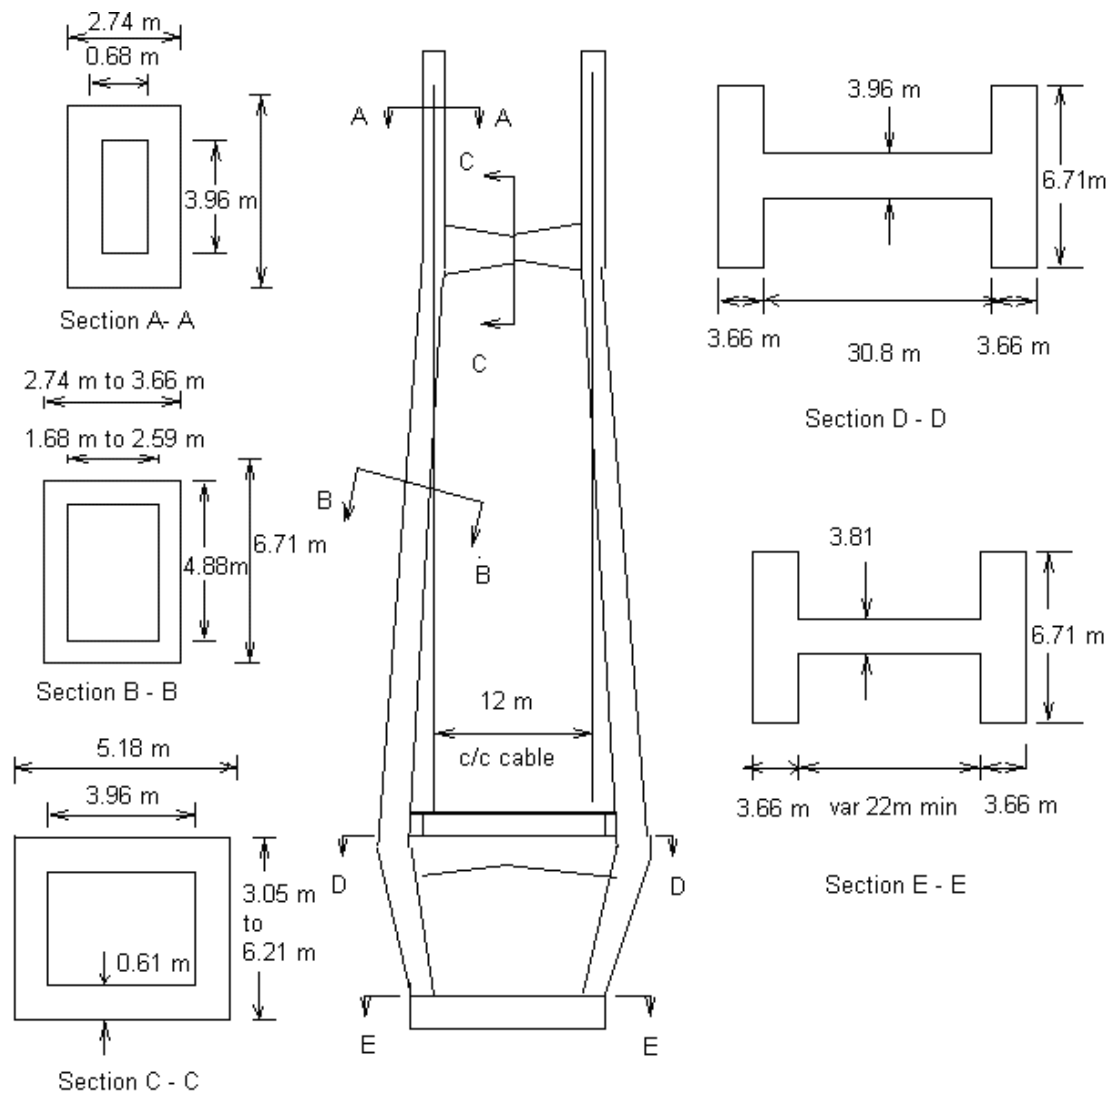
Pylon details [Dyke *et. al.* (2003)]
